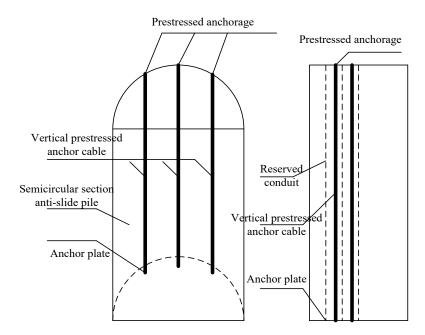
Semicircular Vertical Prestressed Anchor Cable Anti-Slide Pile Structure
